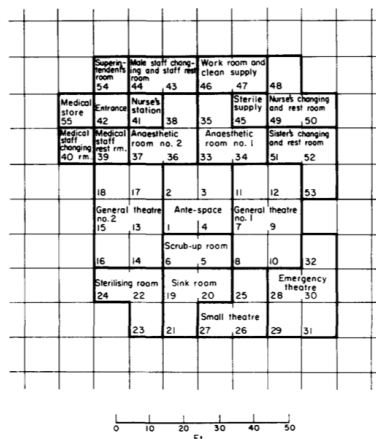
One of the generated floor plan layouts (Whitehead and Eldars 1965)
